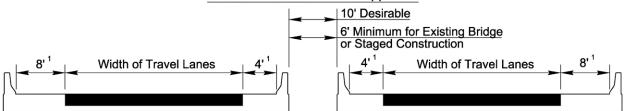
Arterial System Bridge Deck Widths for Four or More Lanes Divided Shoulder Approach and Curb and Gutter Approach
